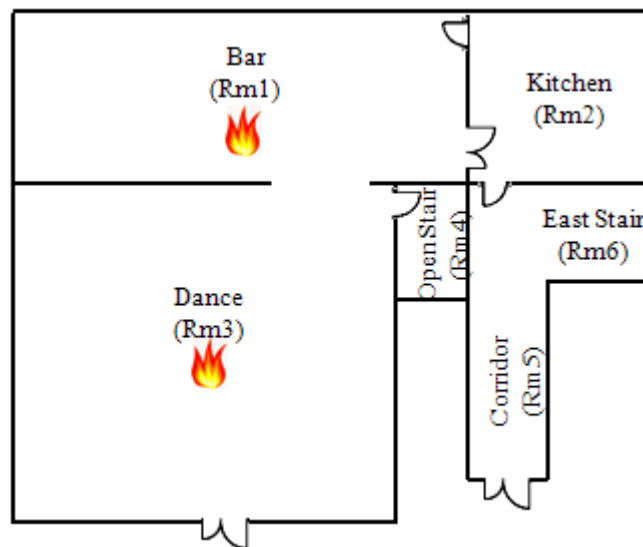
Geometry as modelled in BRANZFIRE – Bar / Dance floor fire at ground level
